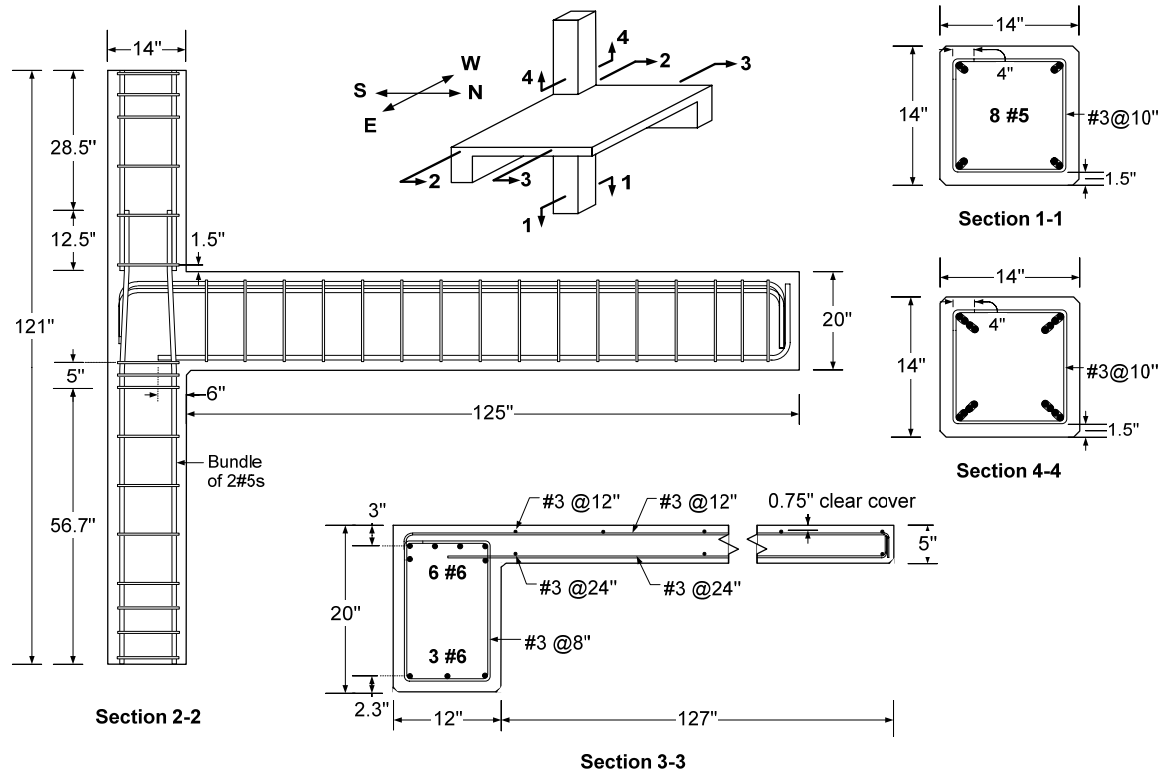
Reinforcement details (1 in.=25.4 mm).
